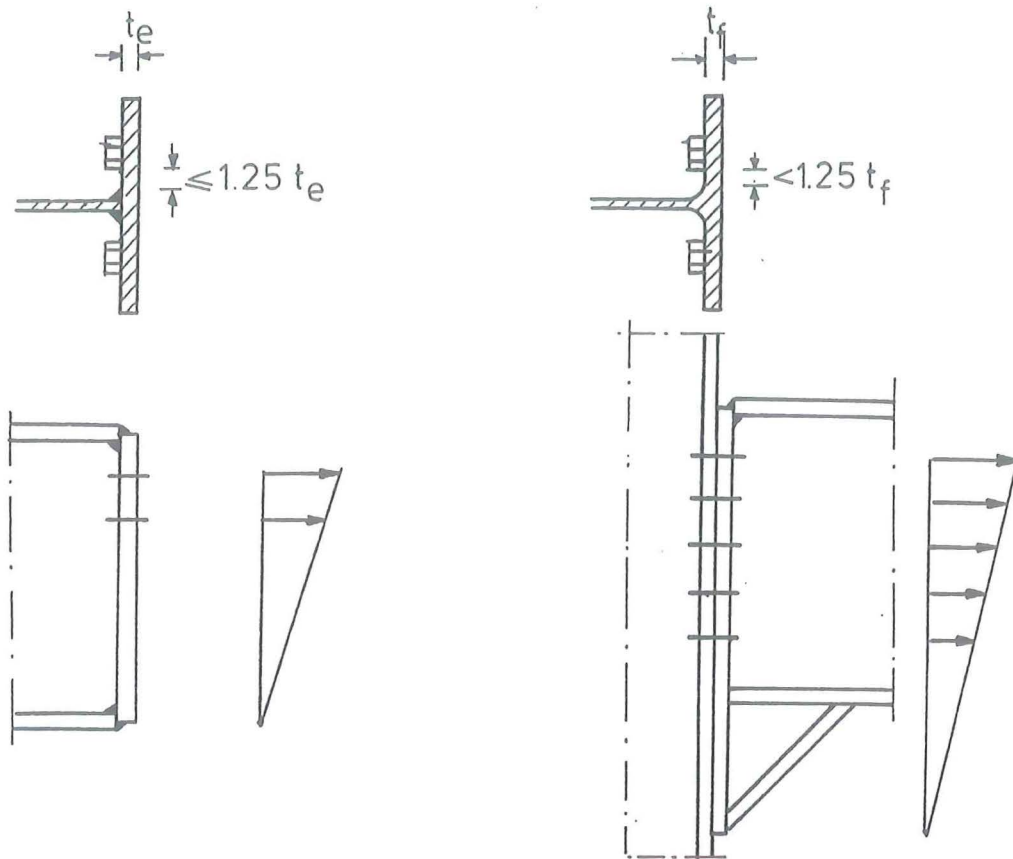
Fillet weld between end-plate and beam-flange at the tension side of the connections
